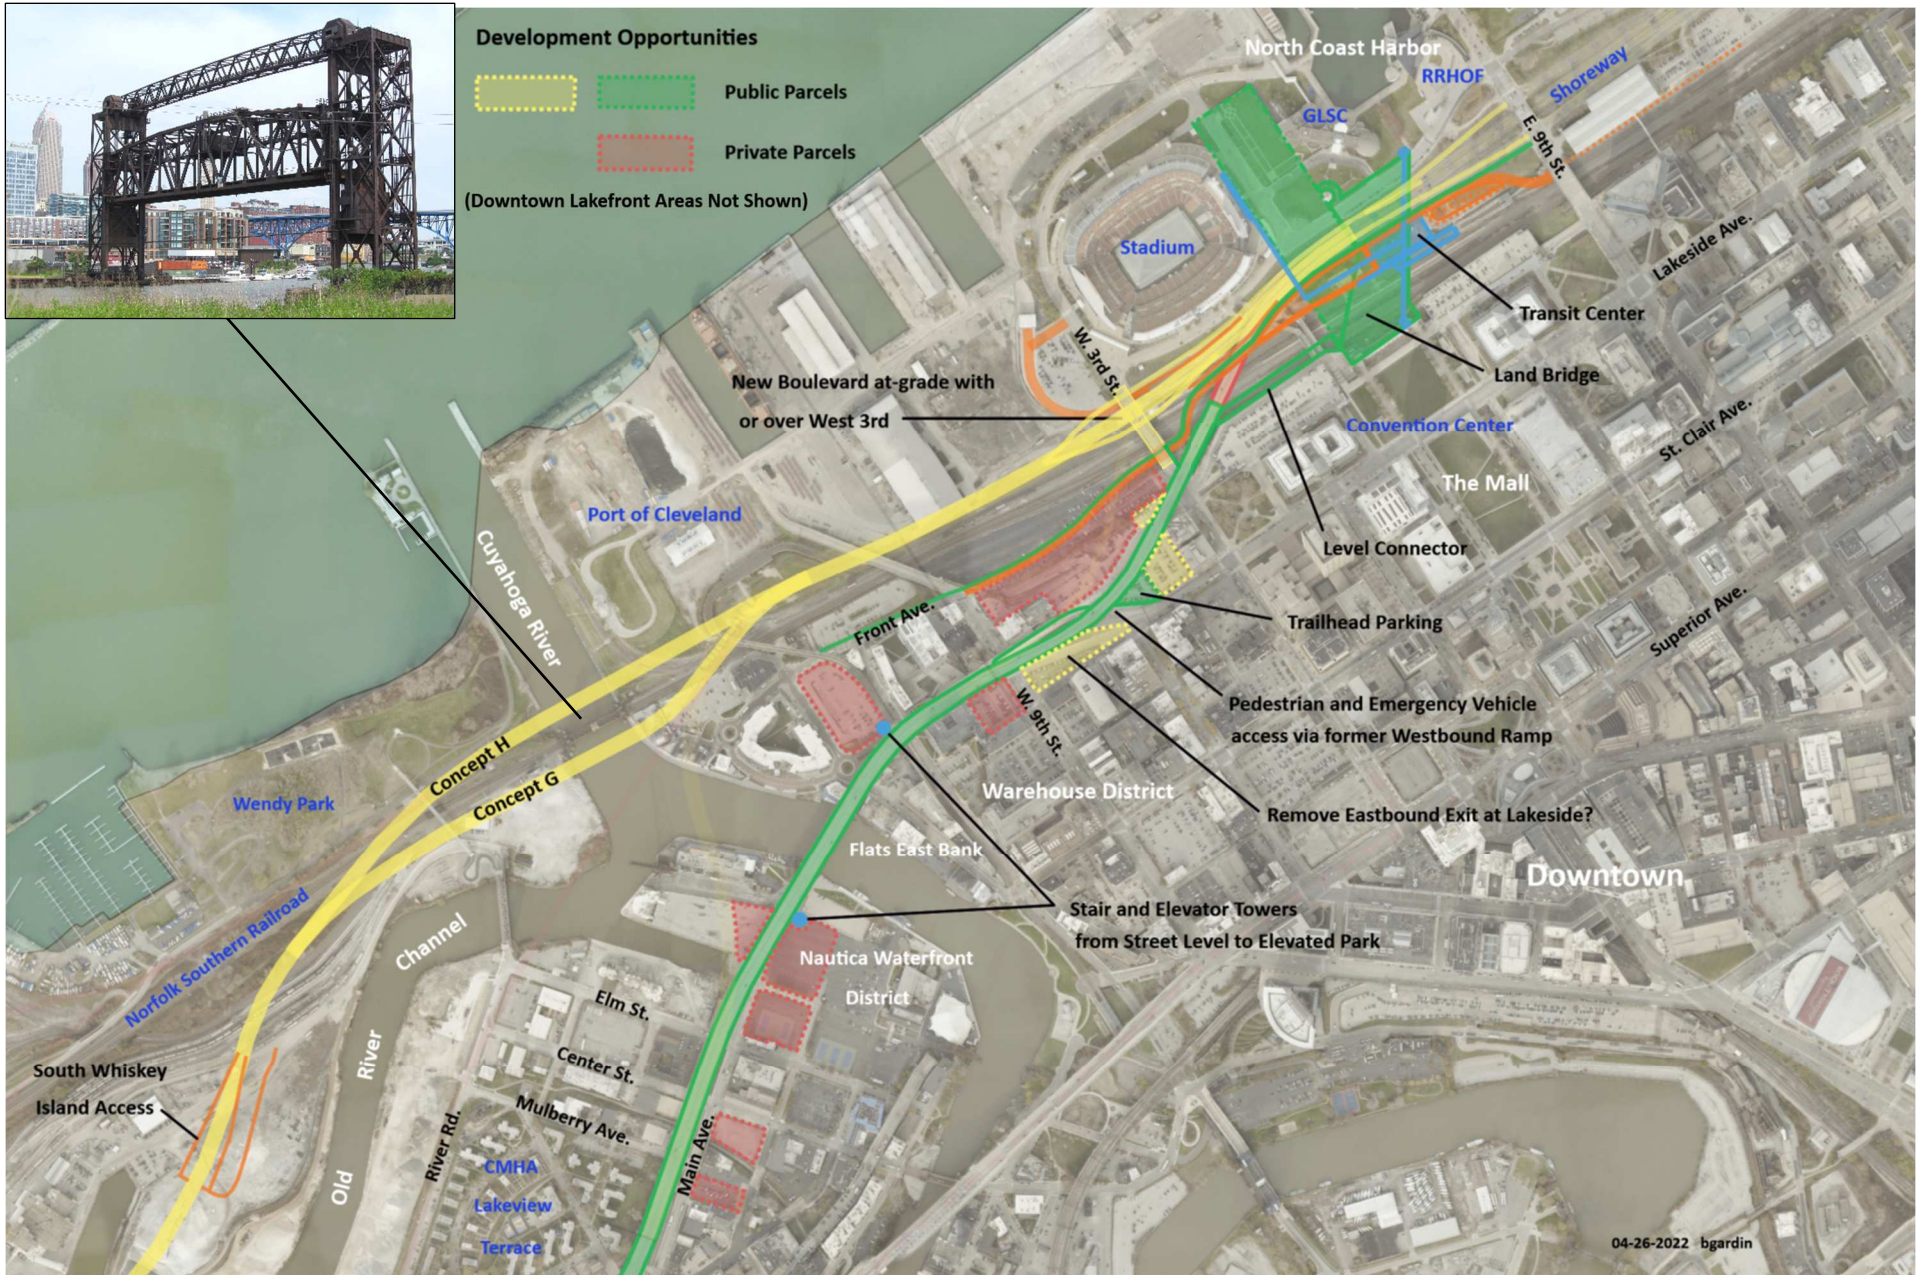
Concepts G & H – East Section, with inset photo of Cuyahoga River Bridge #1
